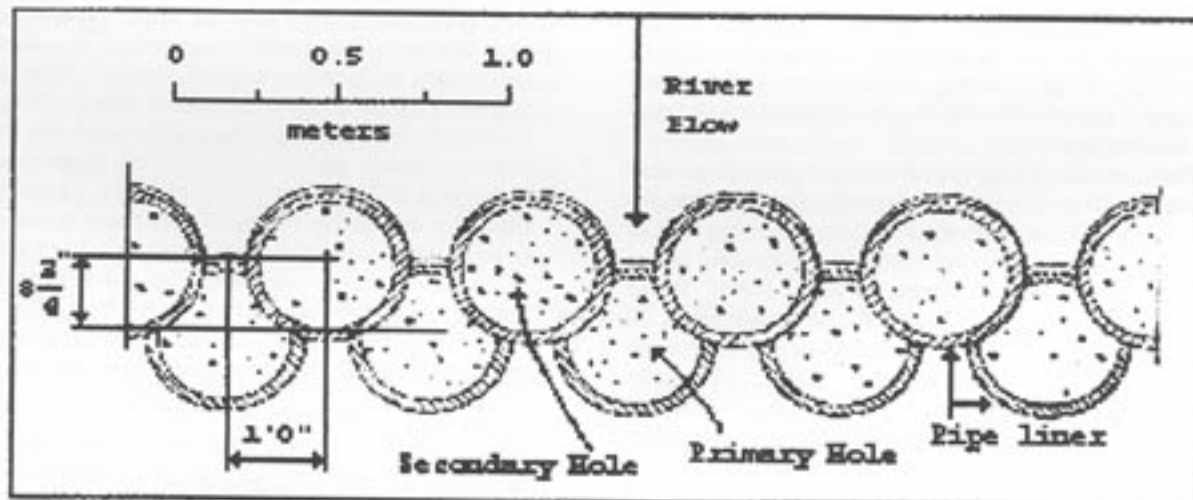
Schematic diagram of a subterranean grout curtain (plan view) used by the TVA to seal leaky karst dams (After White 1988).
